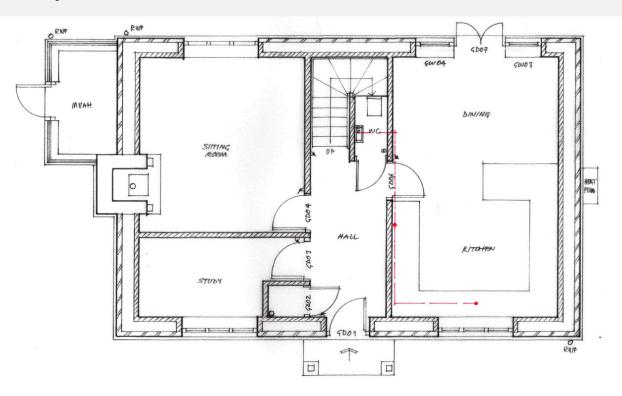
Ground Floor Plan. Drawing by Lacey Interior Architecture Ltd.
